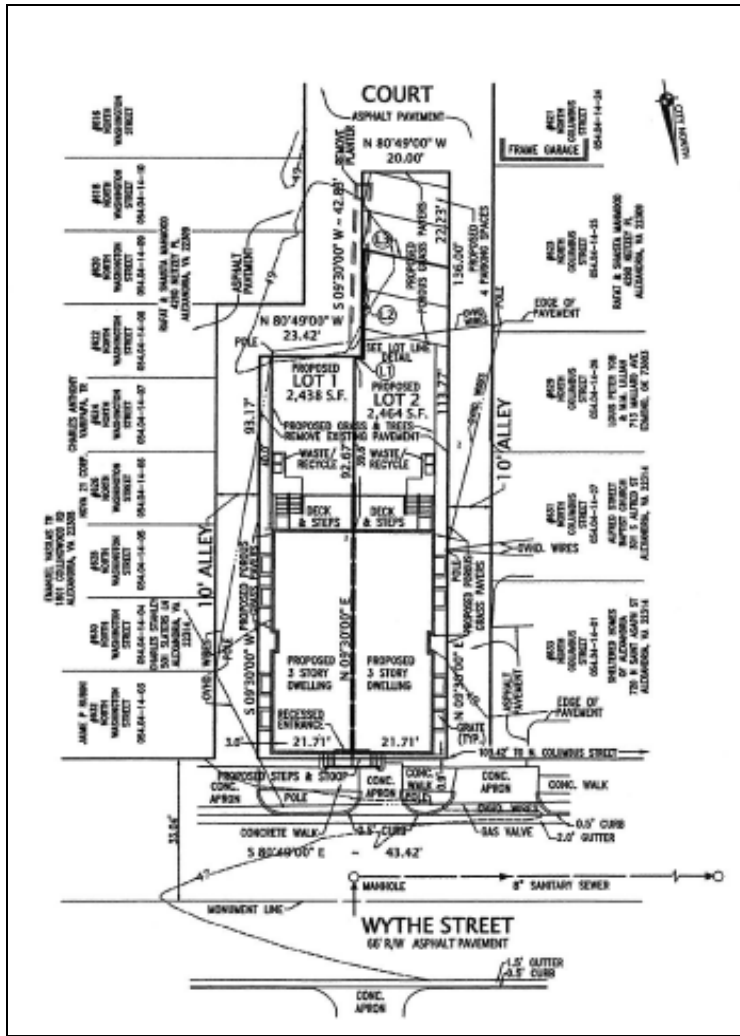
Plat showing subdivided lots and location of proposed dwellings.
